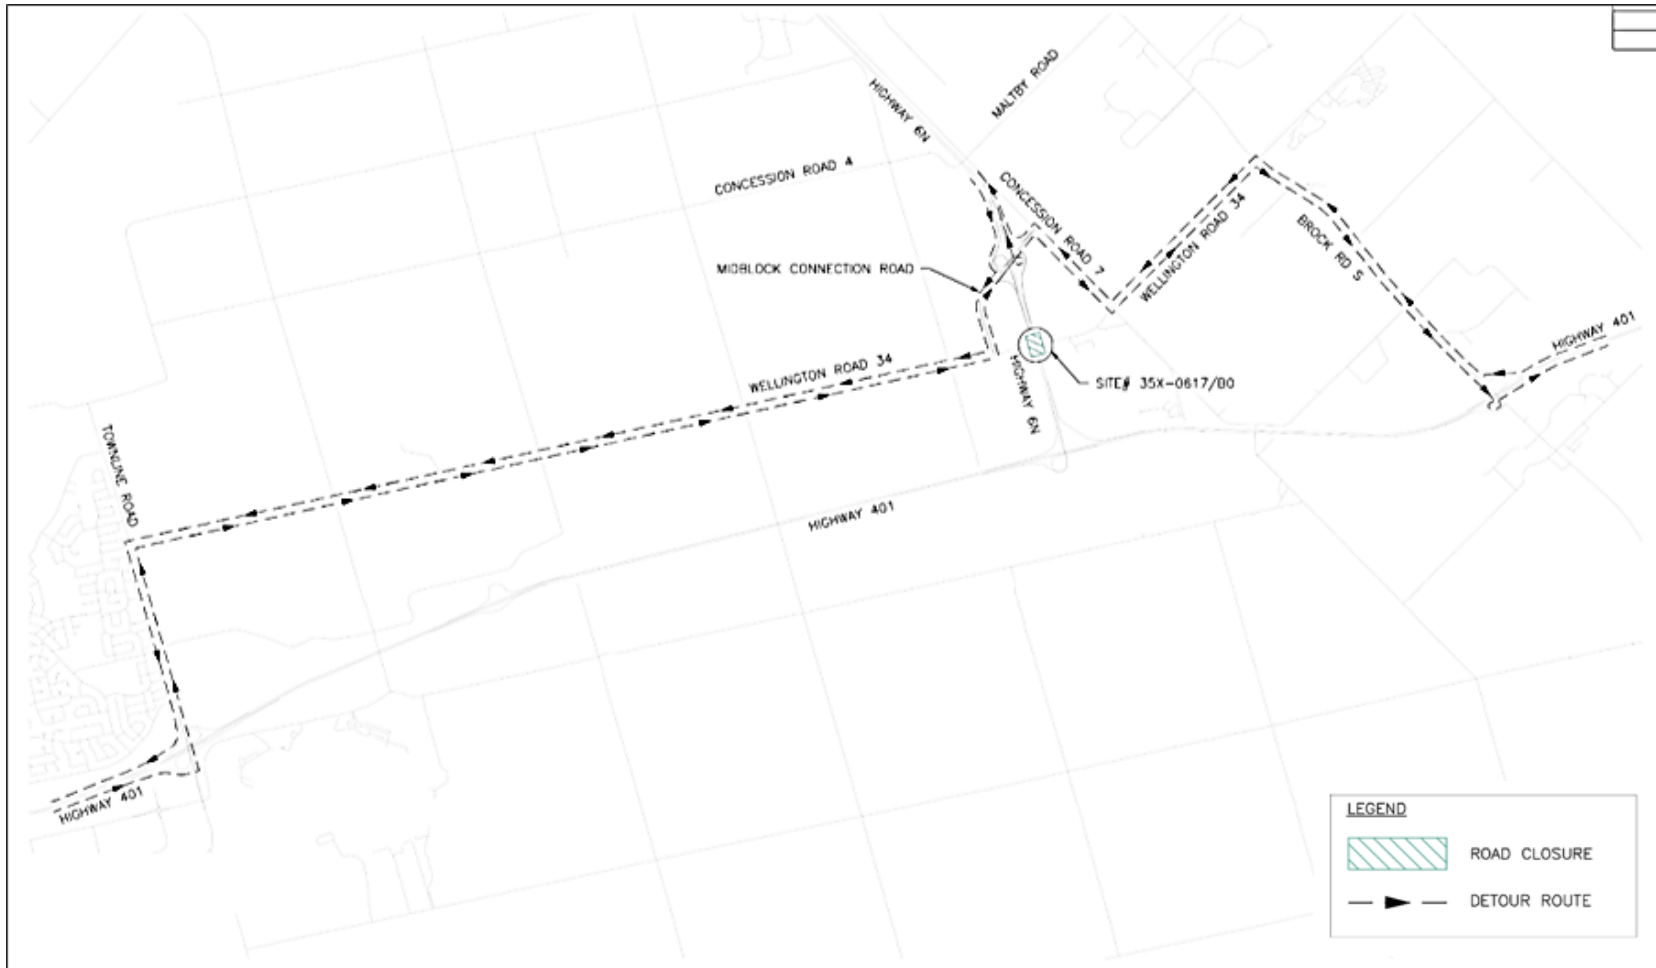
Detour Route for the placement of the Wellington Road 34 flyover structure (Remaining Works)
